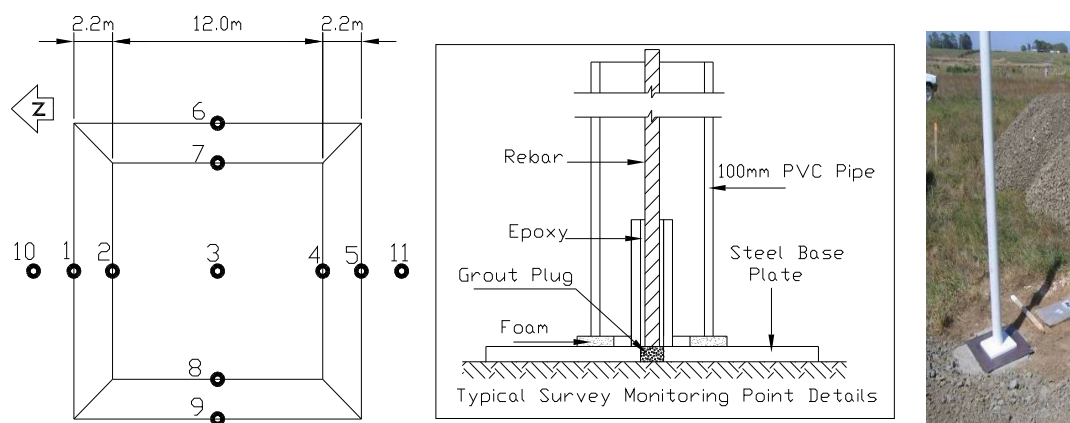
Preload trial layout with details and photo of a typical monitoring point.
